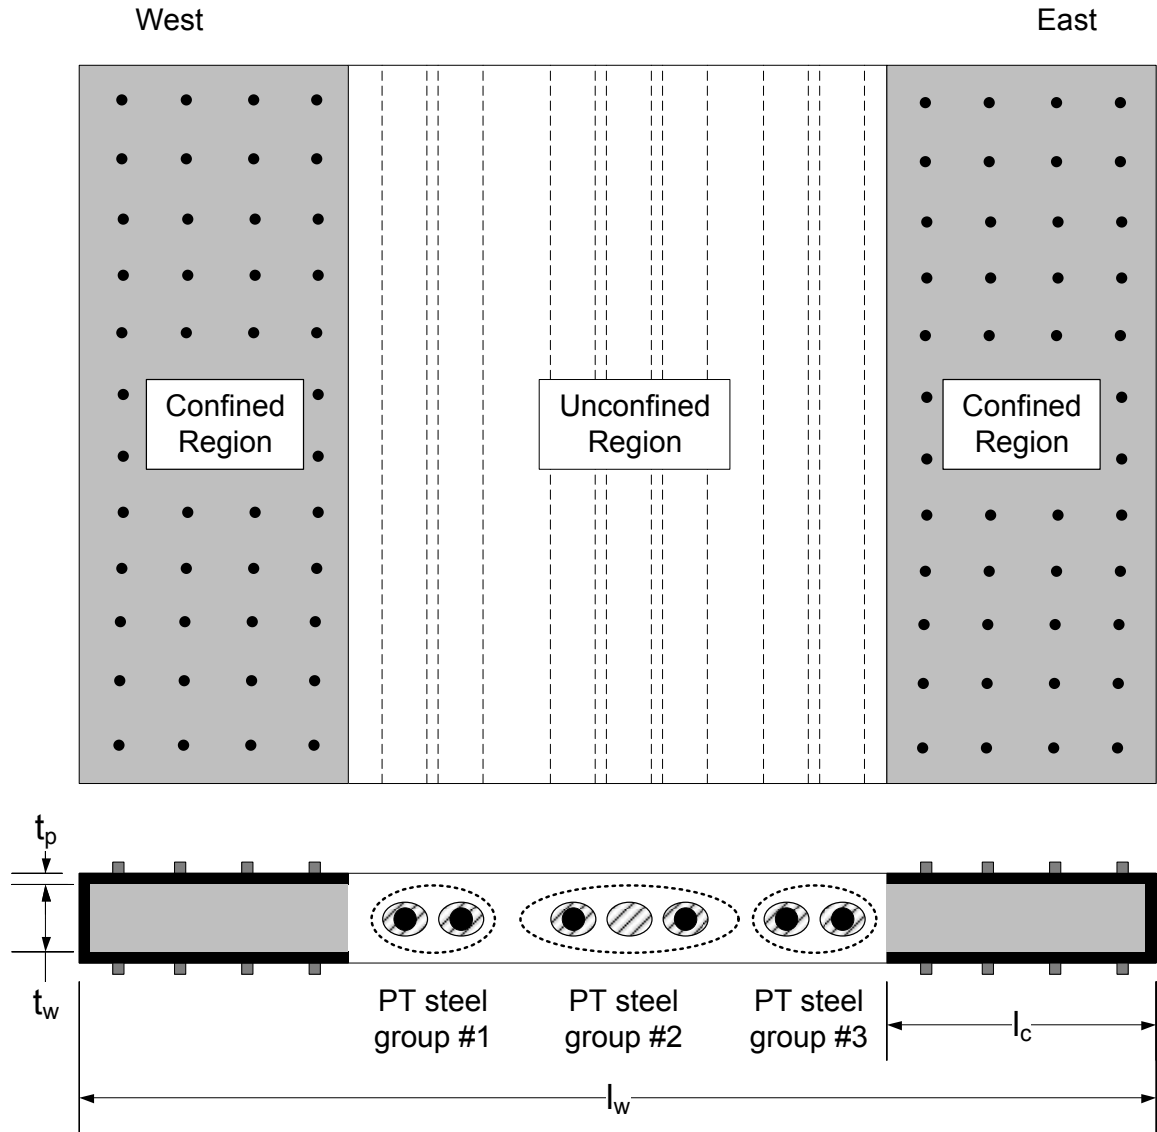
Elevation and Section Schematics of Plate-confined Panel Design
